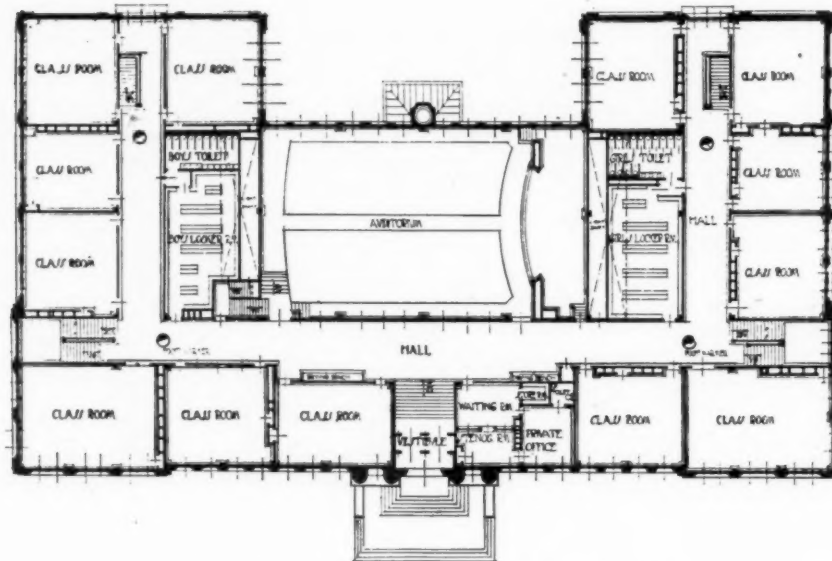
THE FIRST FLOOR PLAN OF A SCHOOL HOUSE
